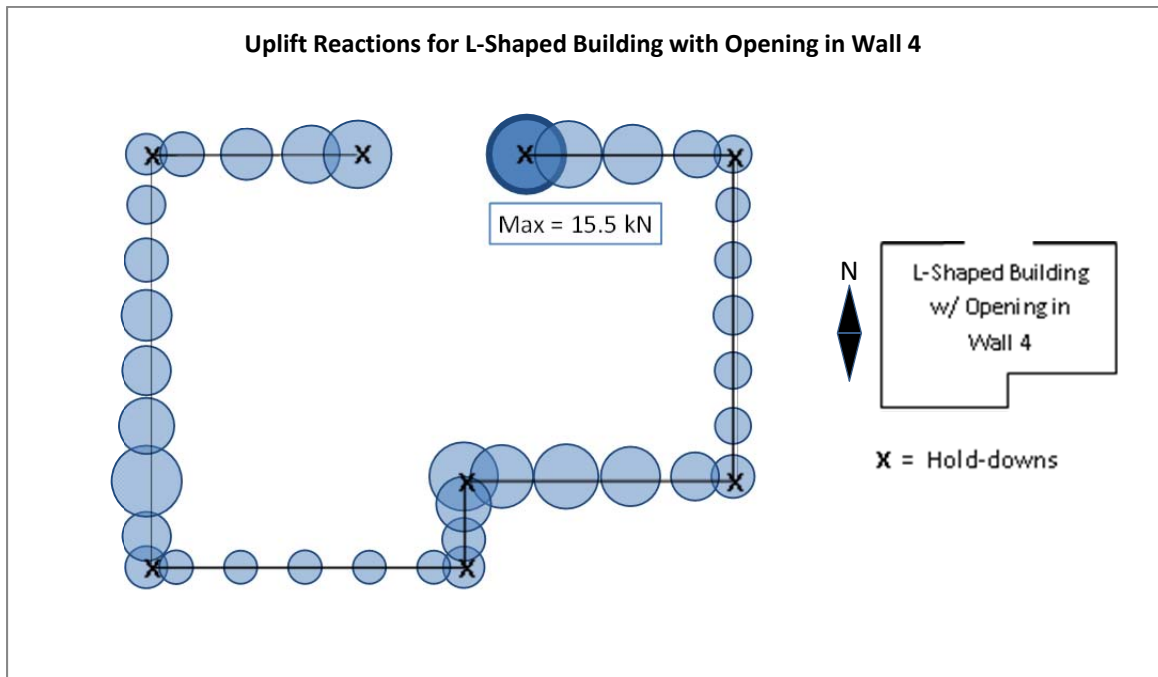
Uplift Reactions for L-Shaped Building with Opening in Wall 4 (under Uniform Uplift Pressure)
